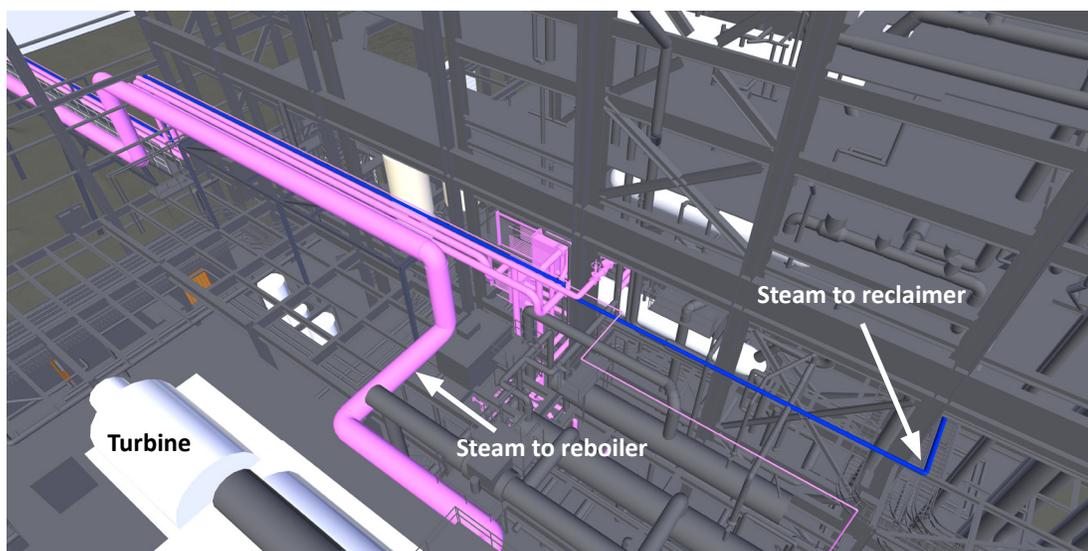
Proposed design and location of reclaimer steam line (highlighted in blue with the north wall of the powerhouse hidden)
